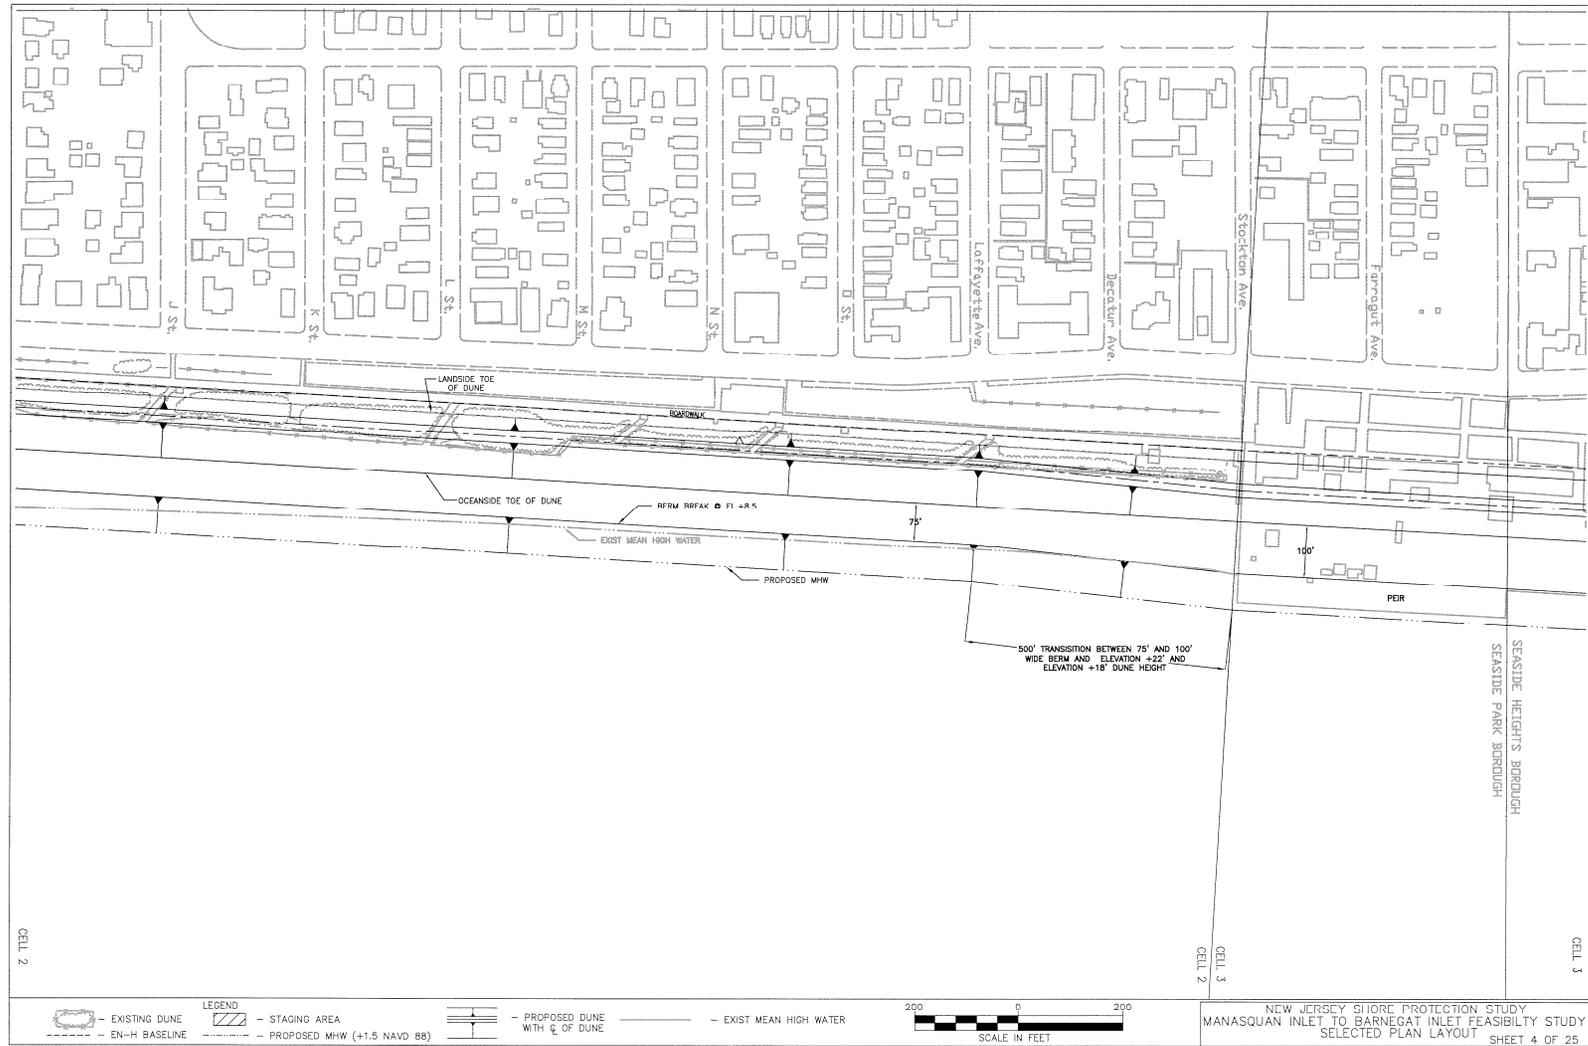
Selected Plan Layout – Seaside Park Borough, J Street to Farragut Avenue
